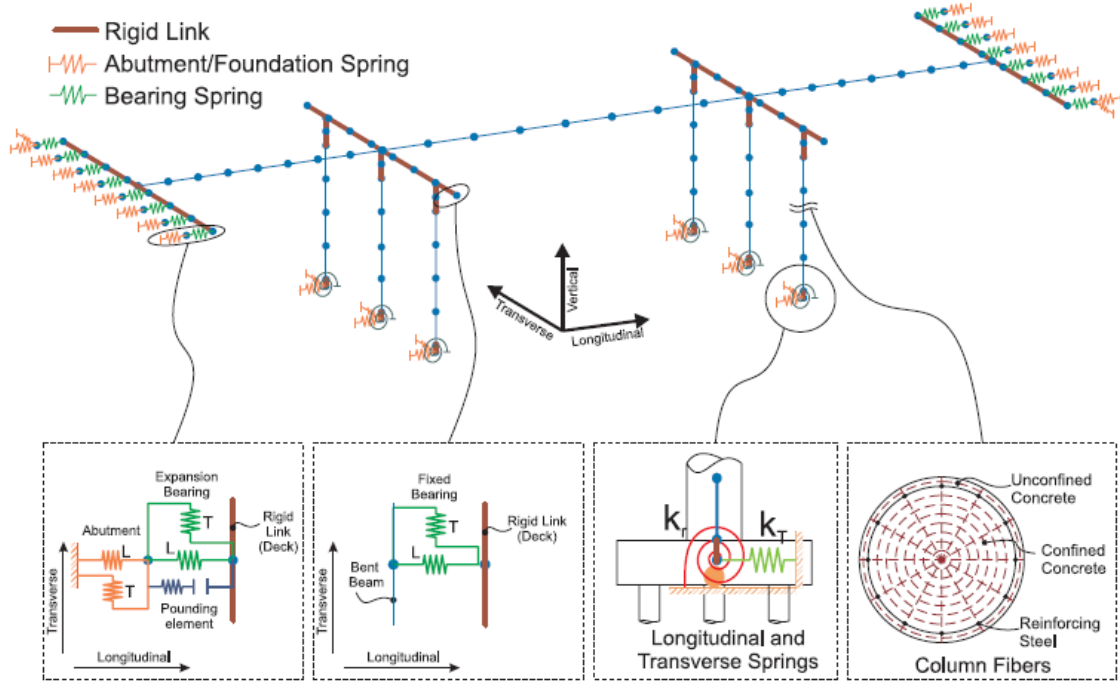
General Model Scheme for 3-D MSC Steel Girder Bridge (Nielson and DesRoches, 2007)
